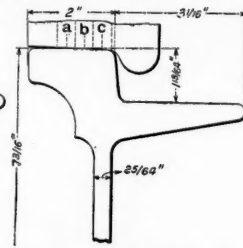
Rail Beveled to Conform with Bevel of the Car Wheel.
